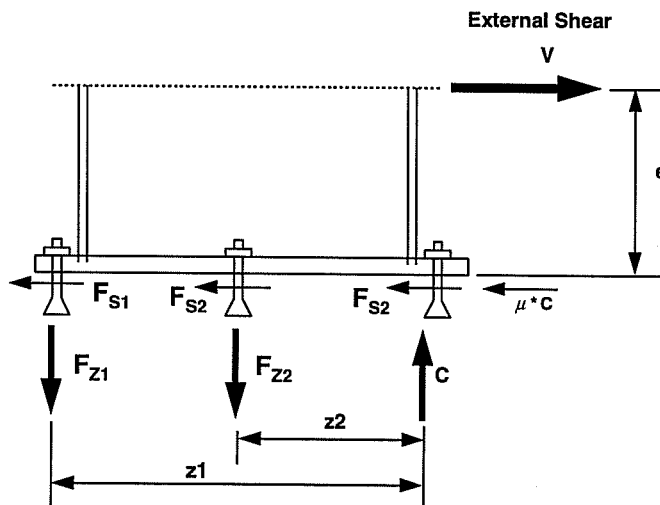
Anchor group with three anchor rows under eccentric shear loading
